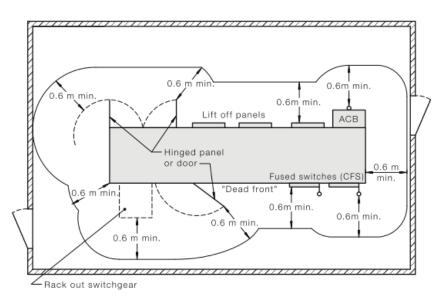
ACCESS TO SWITCHBOARDS—FREESTANDING SWITCHBOARD WITH RACK-OUT SWITCHGEAR
